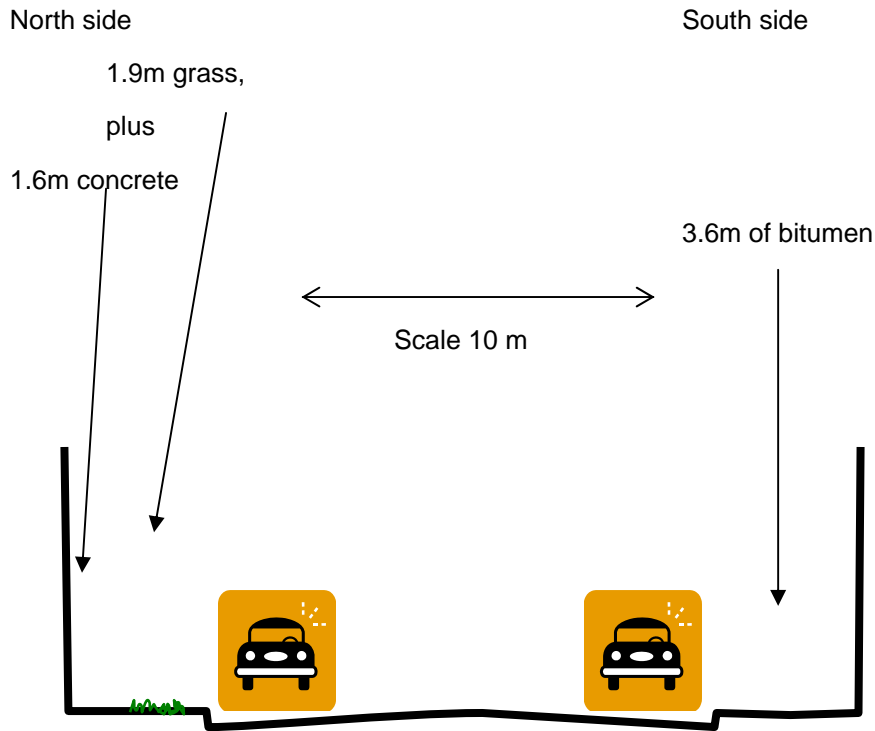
The current situation looking east towards Reiby and Don St. There are 3.5 to 3.6m of space between the gutters and fences.
